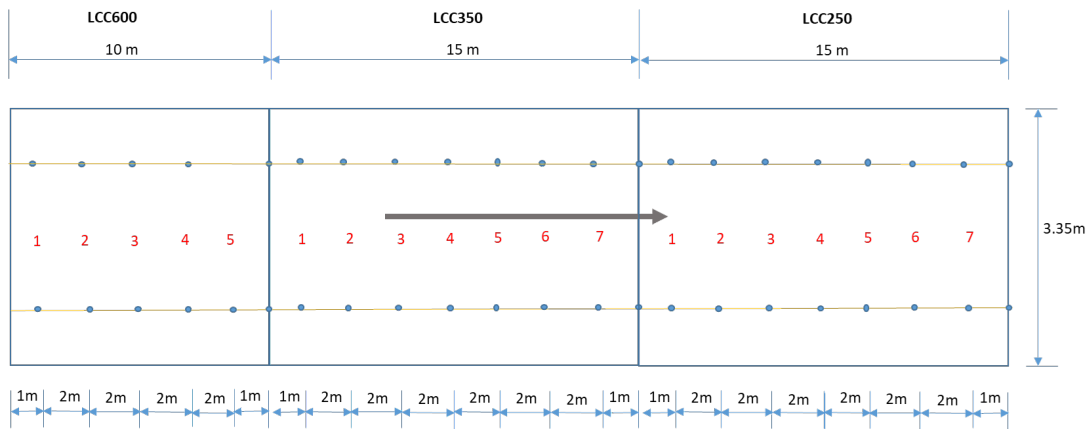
Lightweight deflectometer testing layout (Erbsville Drive)
